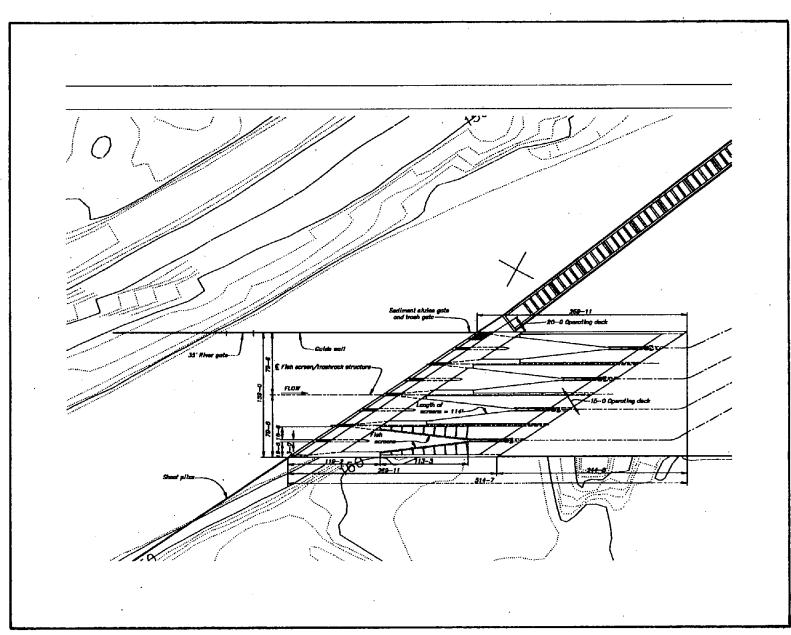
Conceptual layout: Plan view of proposed D alternative.
